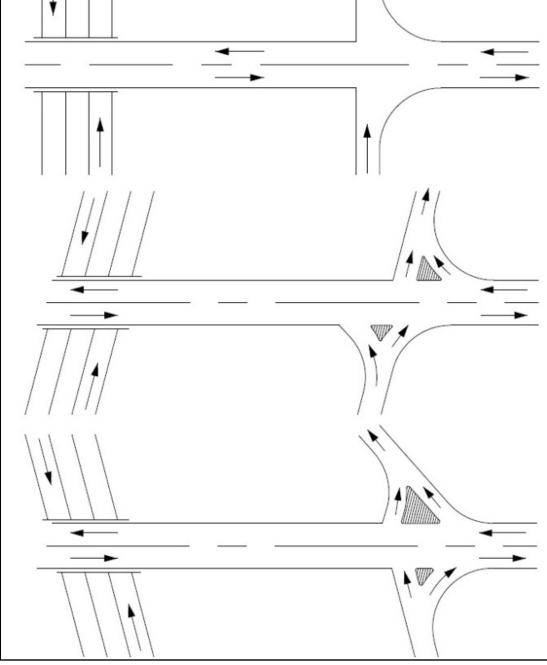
Undivided crossroad designs to discourage wrong-way entry (AASHTO 2011).
